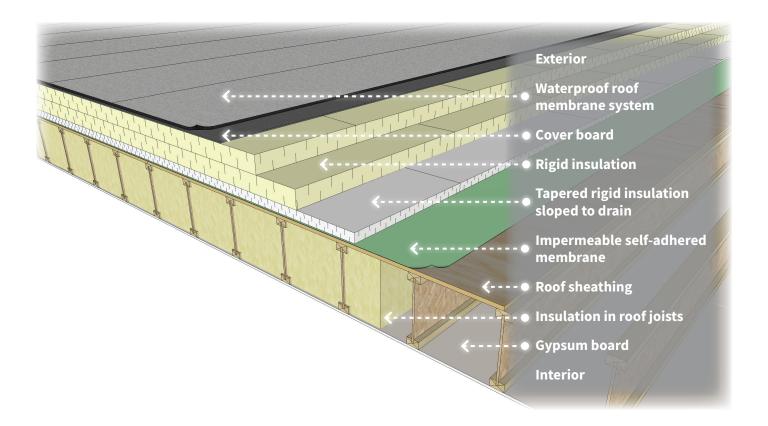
Joist-Insulated Top-side Vented Flat Roof
